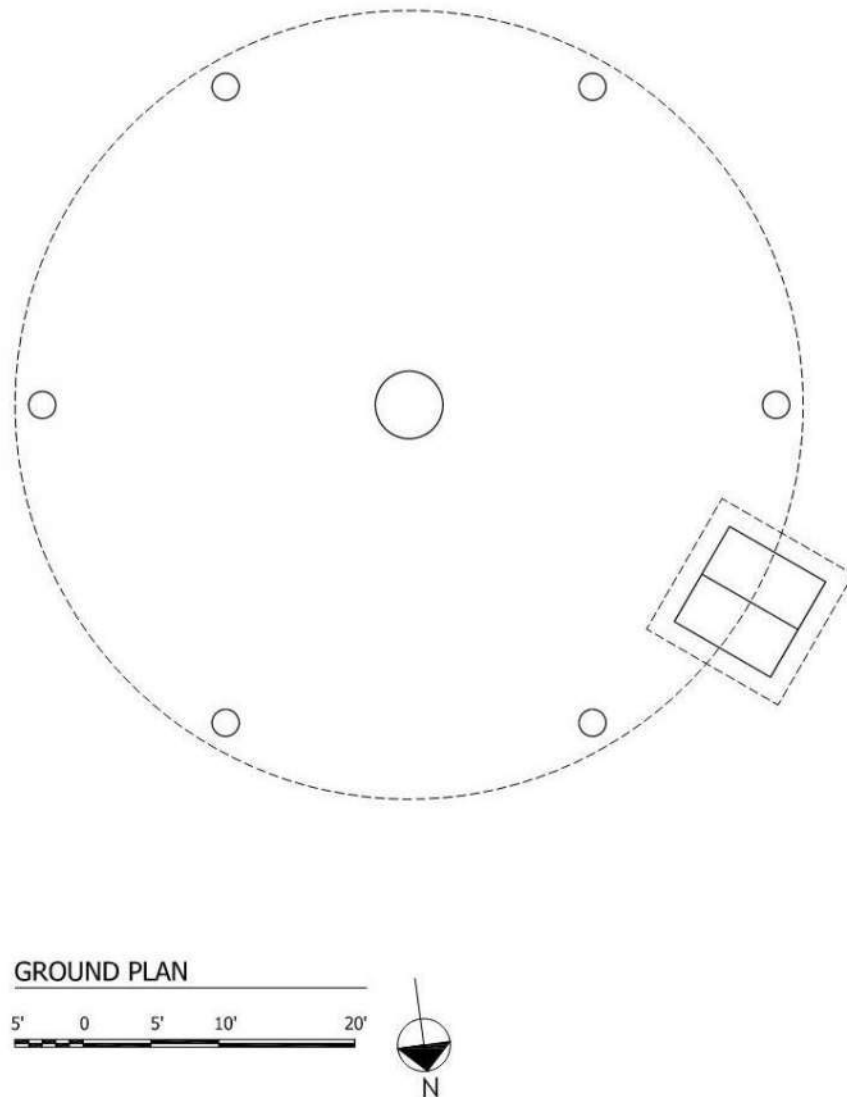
Sketch Plan of the Water Tower showing location of the shed below the tower. Drawn by HPZS.
